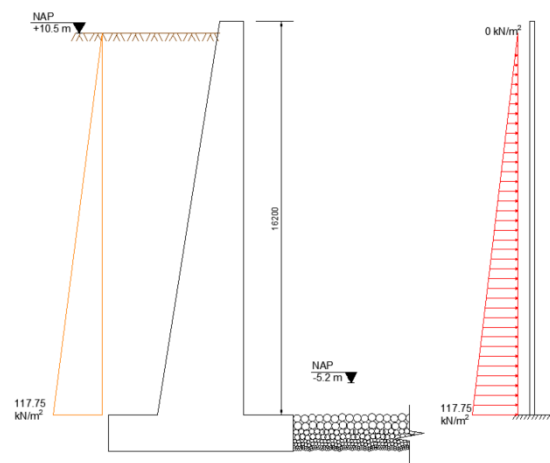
Type 4; Retaining wall with rubble flooring under a simplified load.
